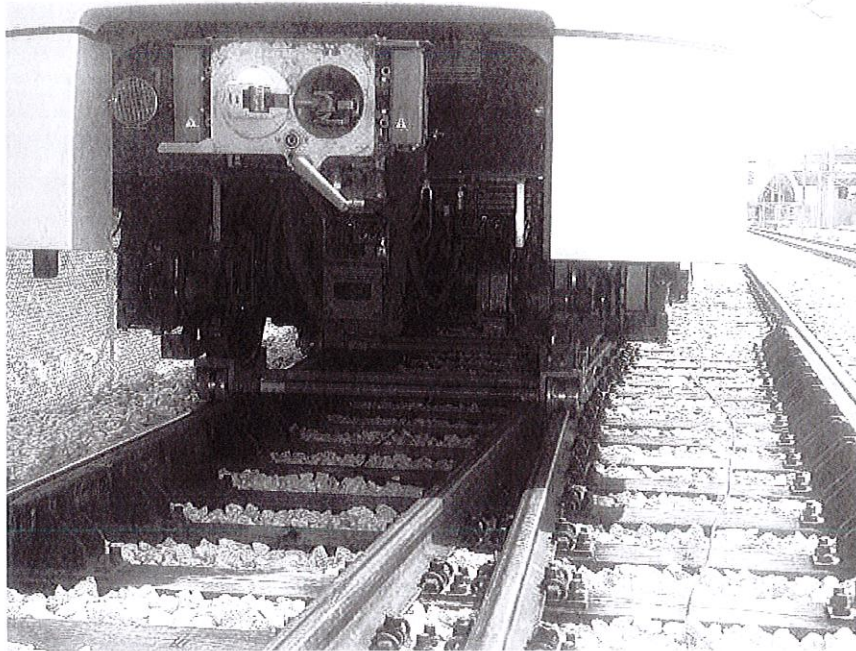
Re-railing Bridge with Bridge Coupling and accessories
